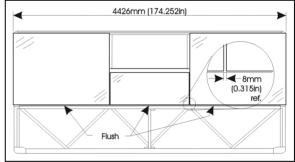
FACE FIXED WINDOW INSTALLATION
